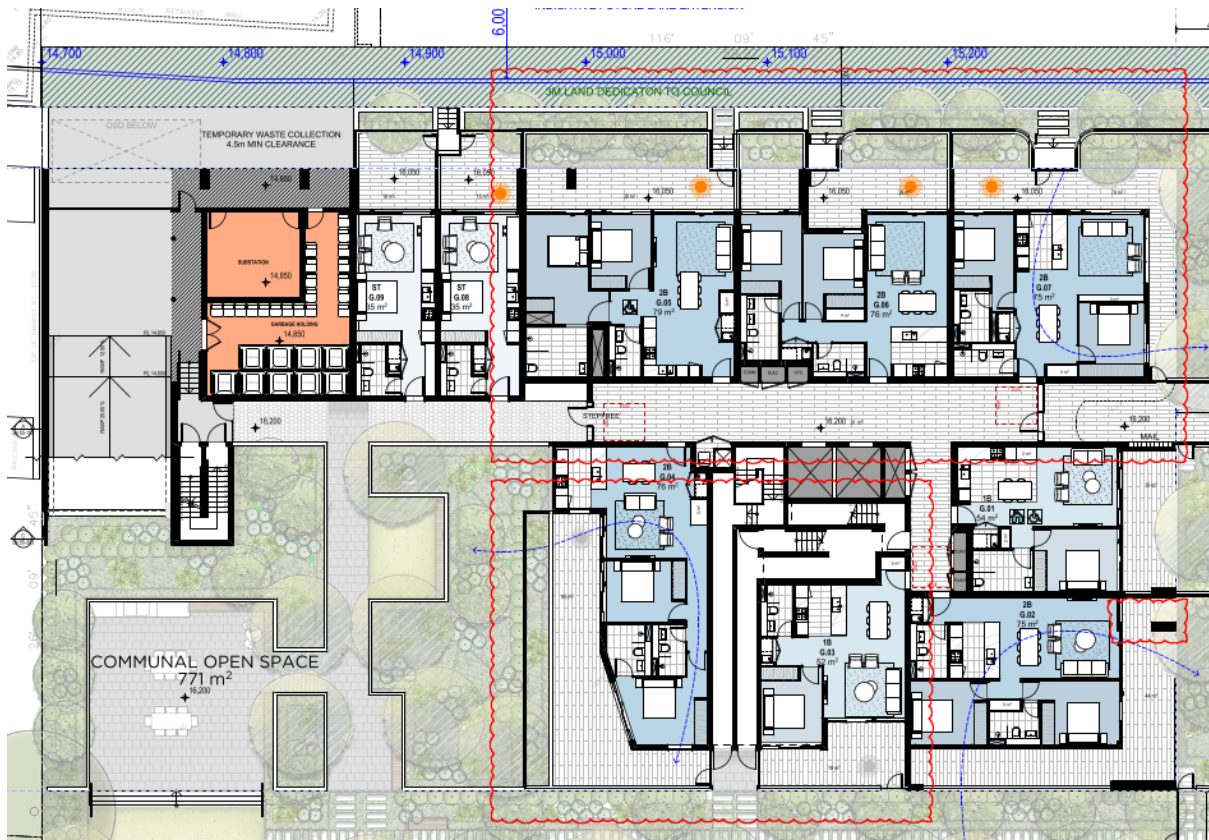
Extract of the approved ground floor in DA2016/170/2.
